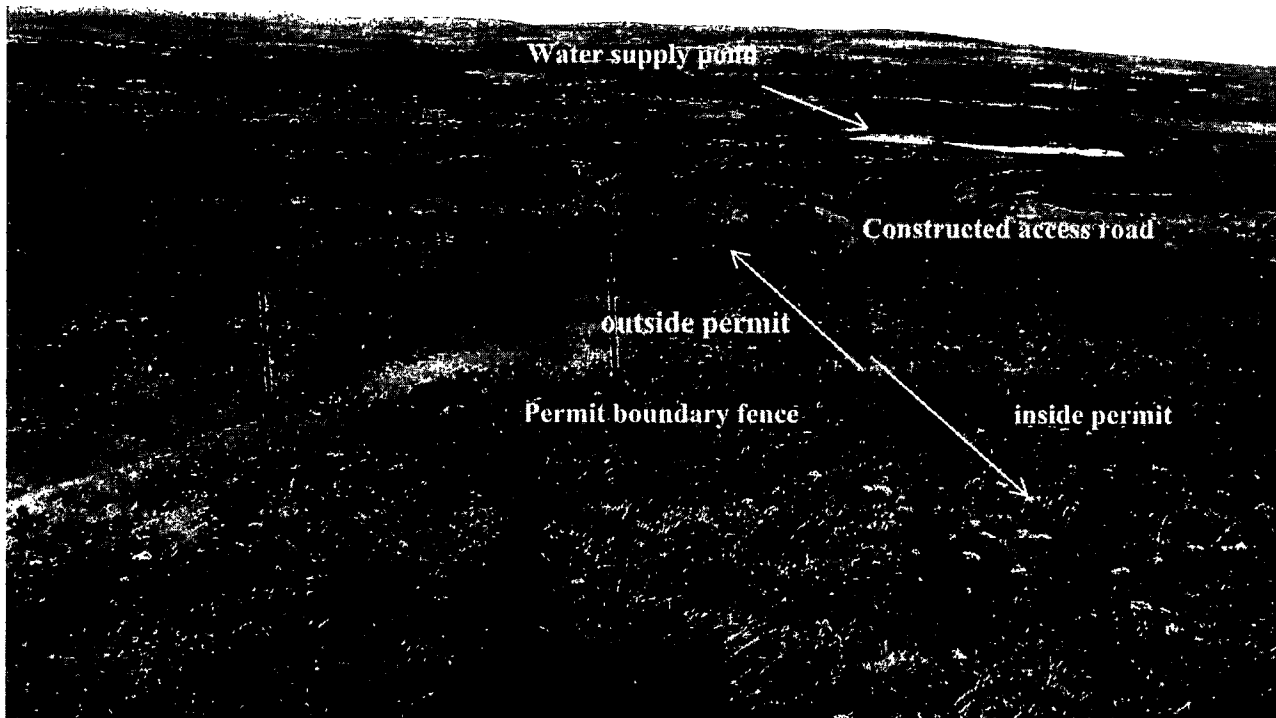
View of constructed road access to water supply pond outside the permit boundary
